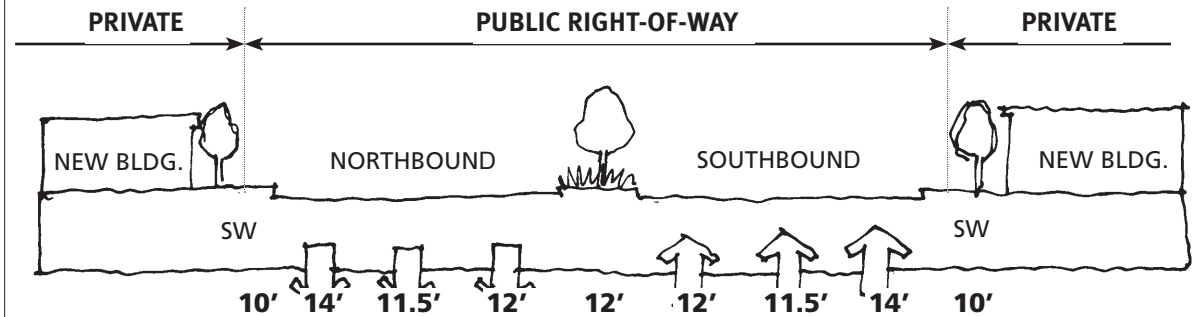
Street section showing new development with the 10' effective sidewalk implemented on El Camino. View looking south.
